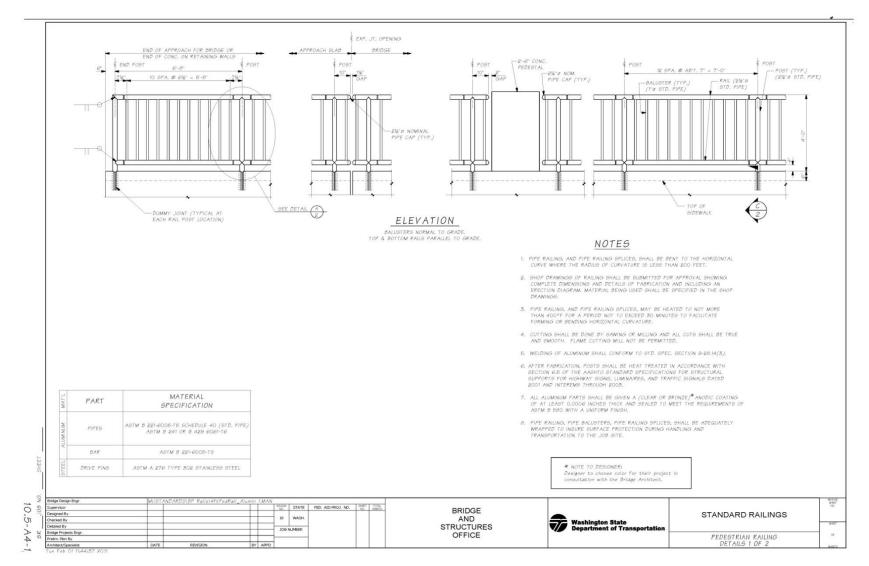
Washington DOT Standard Railing (Sheet 1 of 2) [29]
